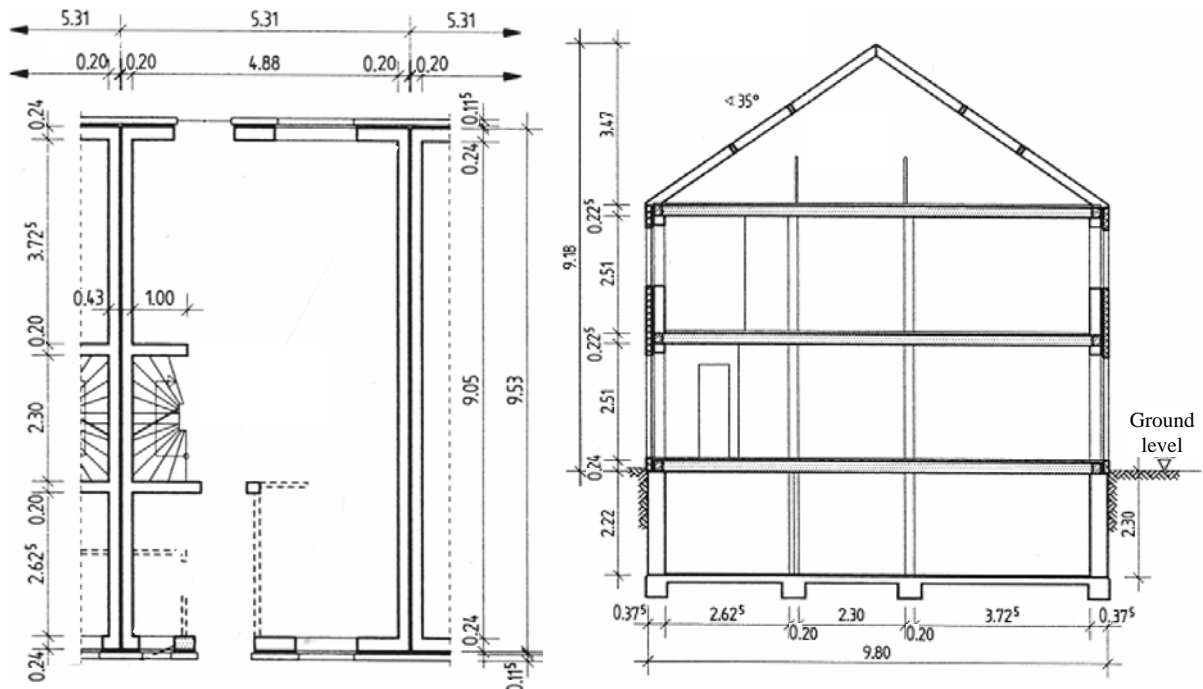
The original terraced house: plan and cut elevation (dimensions in meters)
